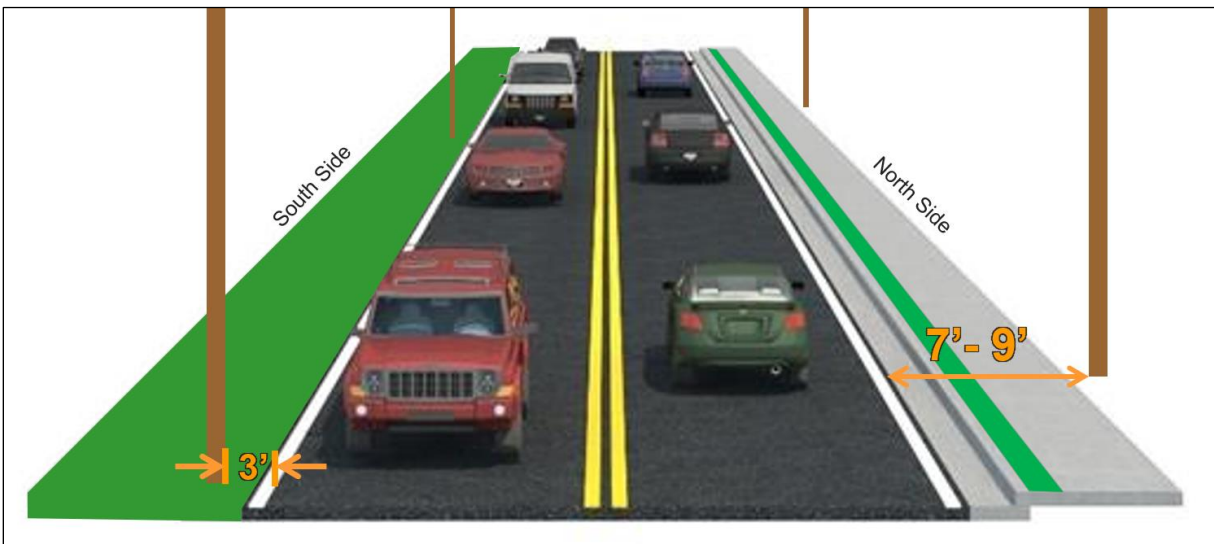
Concept 2A - Two-Lane with Cub and Gutter plus Sidewalk – North Side Only
